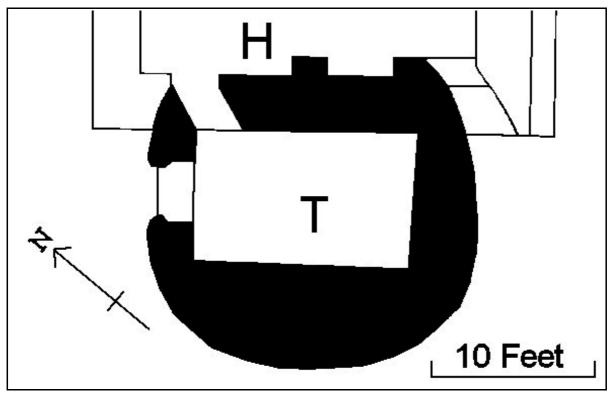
, Ground floor plan of the Llywelyn's tower (T) at Pen y Bryn.
